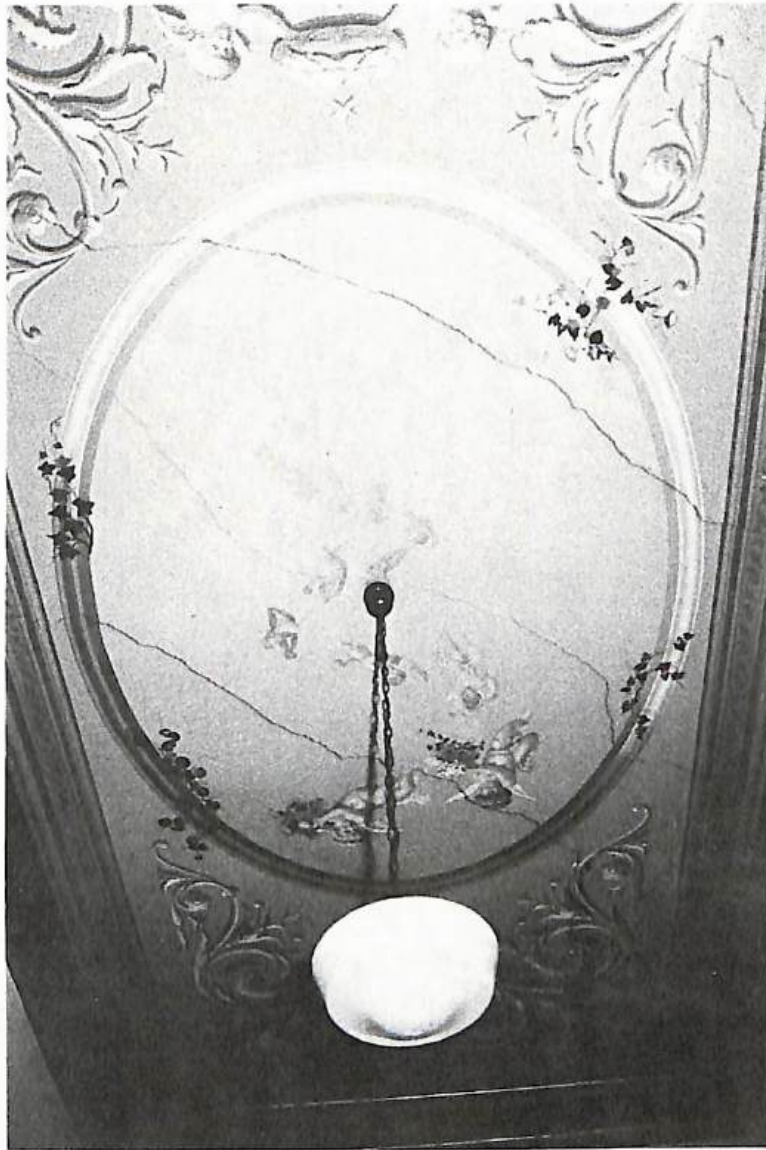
Painted Aperture in the Stair Hall Ceiling. (PSD)
